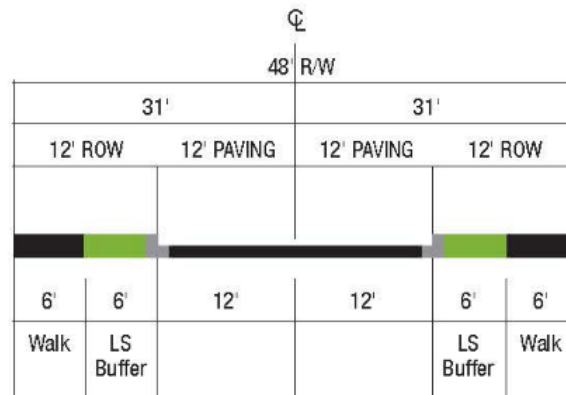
B: TYPICAL STREET SECTIONS
